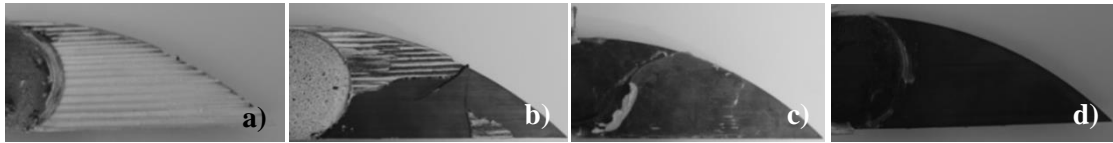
Types of failure modes observed during testing; Type A: failure in wood (a), partial failure in wood (b), Type B: failure in timber and glue interaction (c), failure in glue and CFRP interaction (d)
